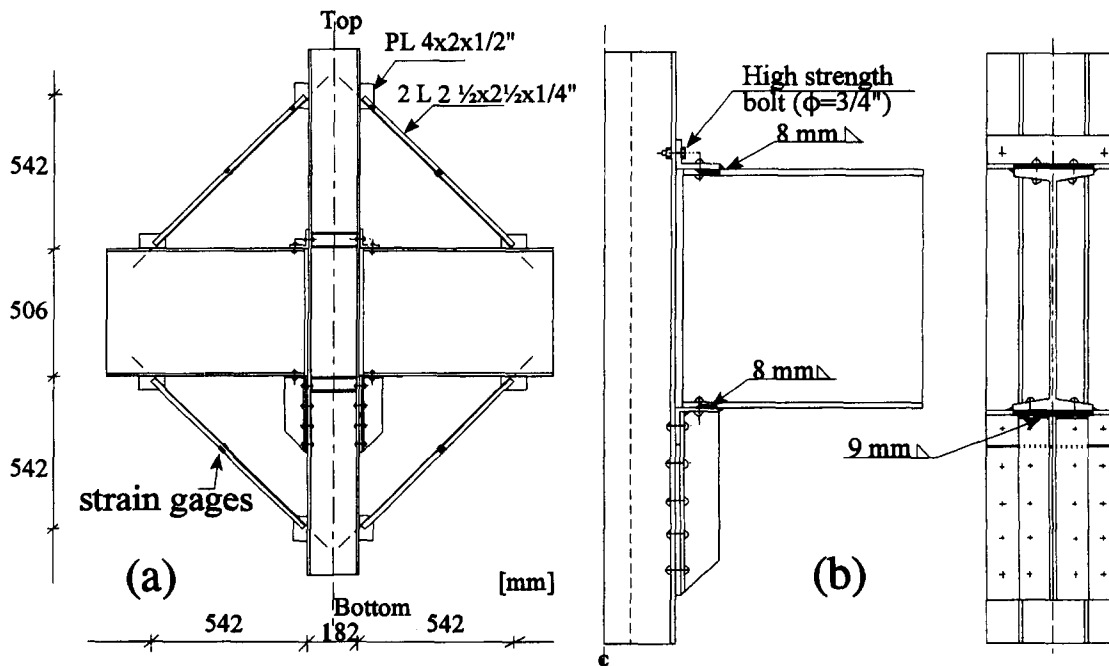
Retrofit Details: (a) Ductile Knee Braces; (b) Selective Welding
